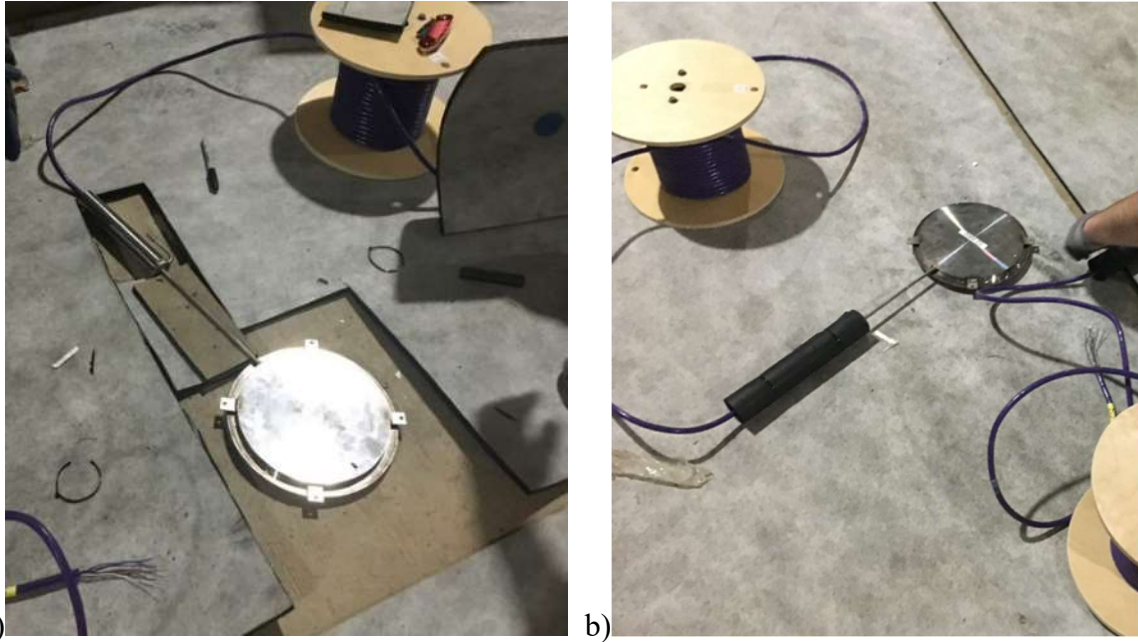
Pressures sensors installed a) directly on tunnel floor, and b) over the UBM
